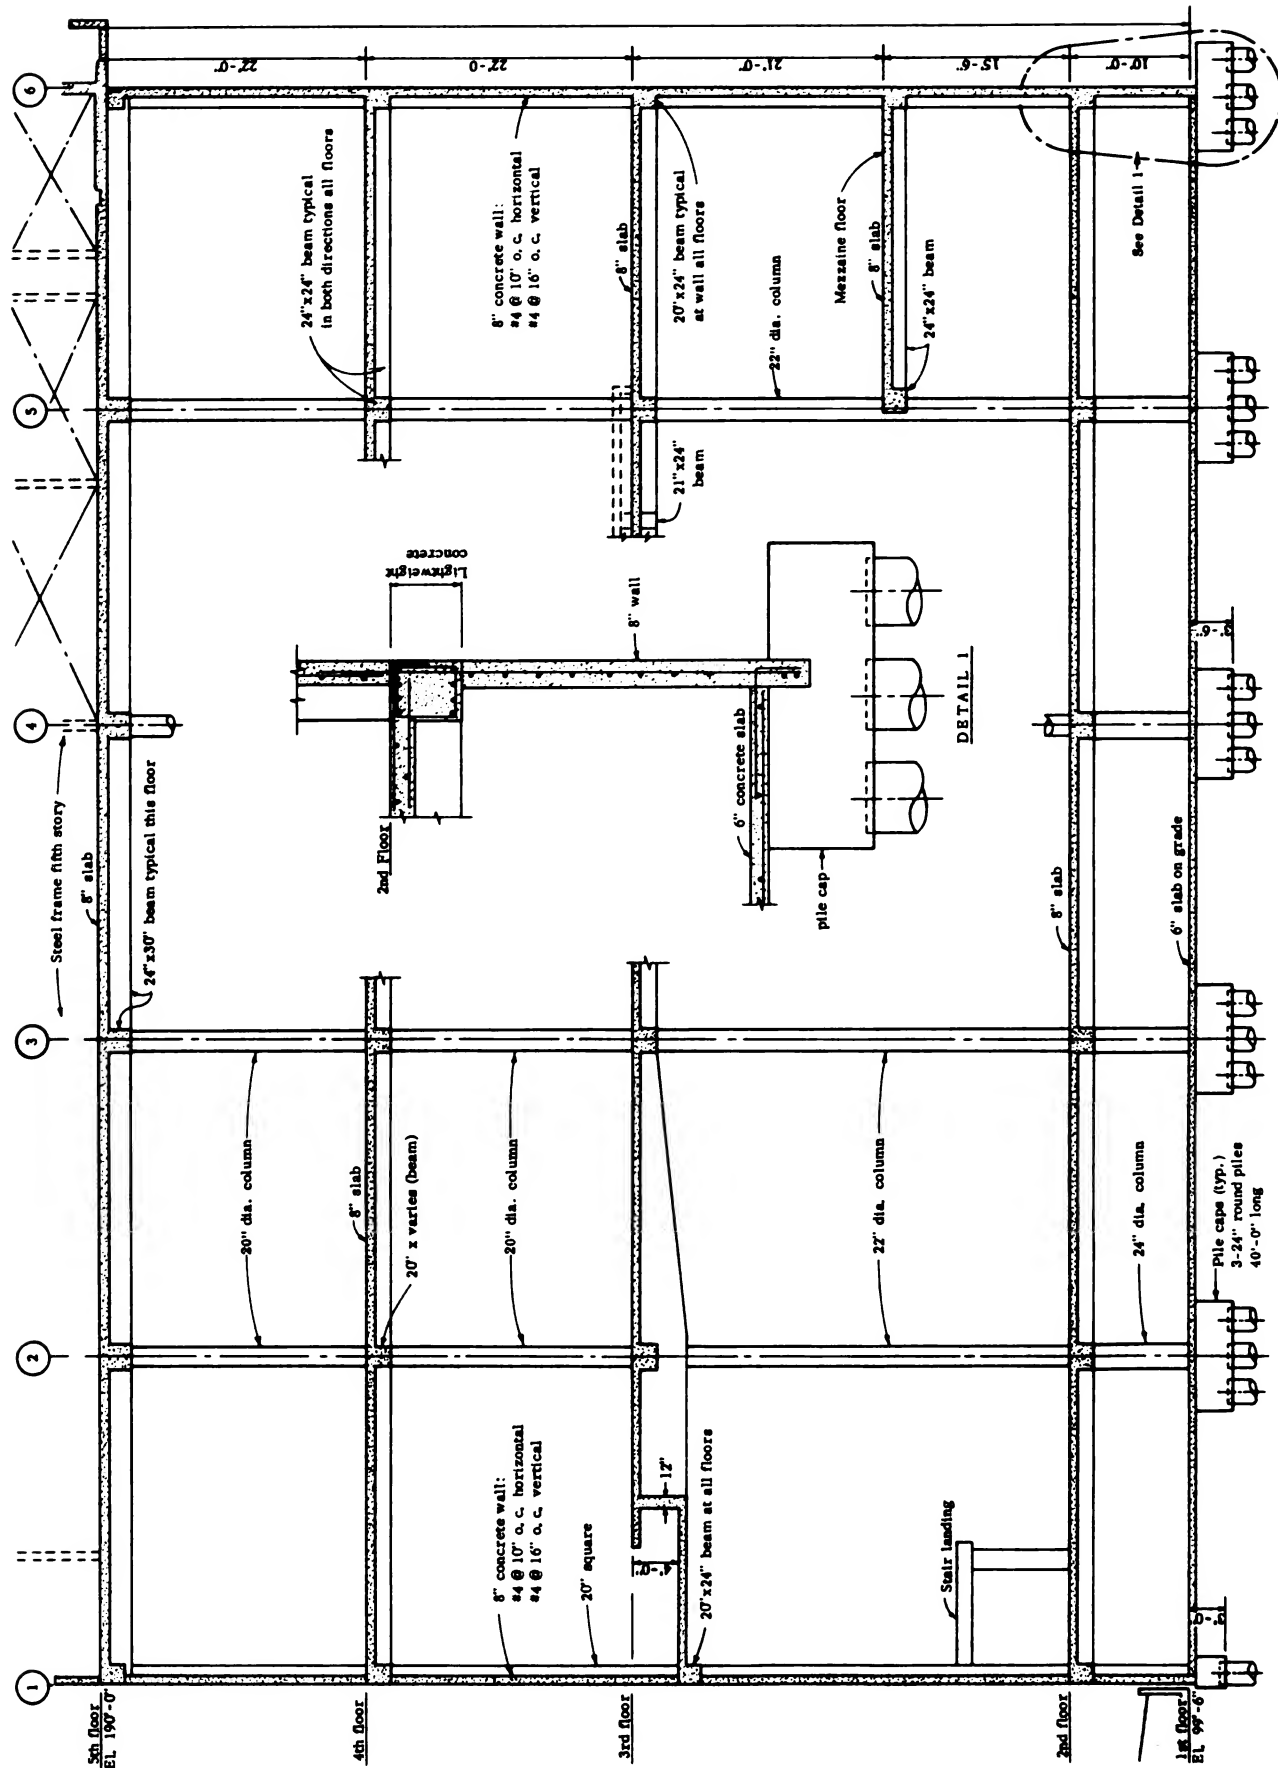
Museum for Antique Cars. Longitudinal section, looking south.
